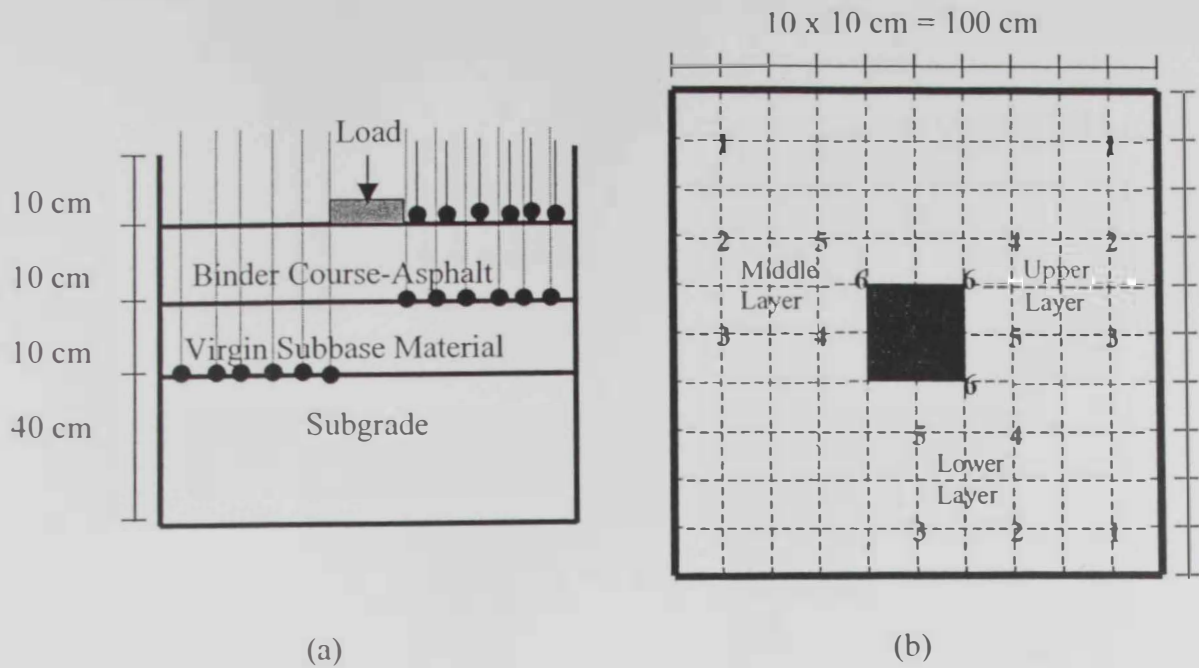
Model Description- Experimental Setting II: (a) Side View for the Layer Thicknesses and Material Types, (b) Top View of the Gauges Location
